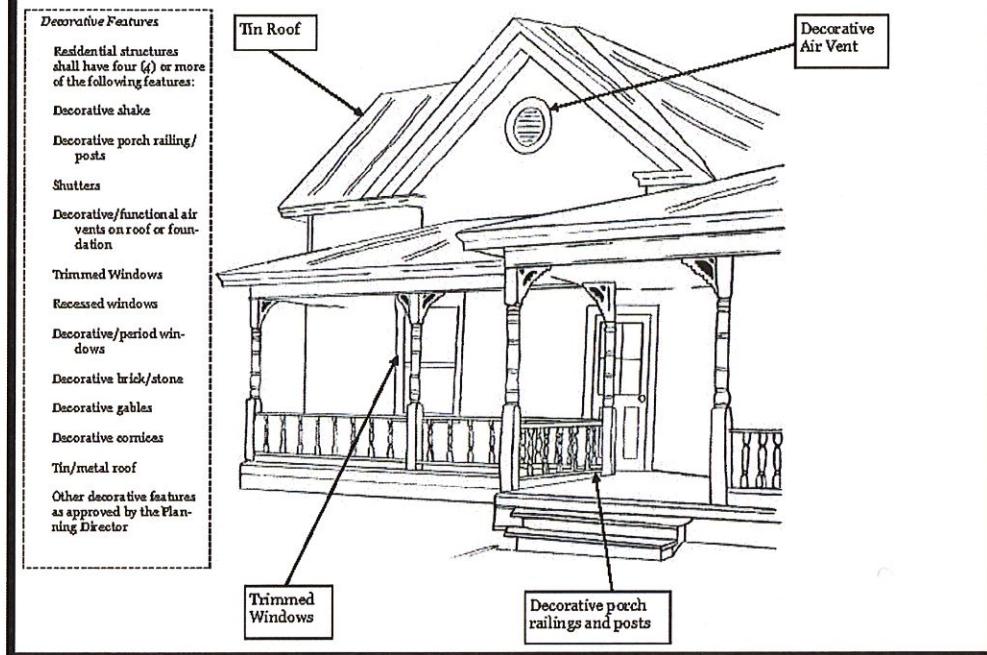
(c): SINGLE-FAMILY DETACHED DWELLING - ROOFS
